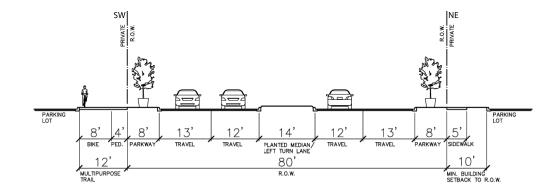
Section C3 - Corridor Road with Multi-Purpose Trail
